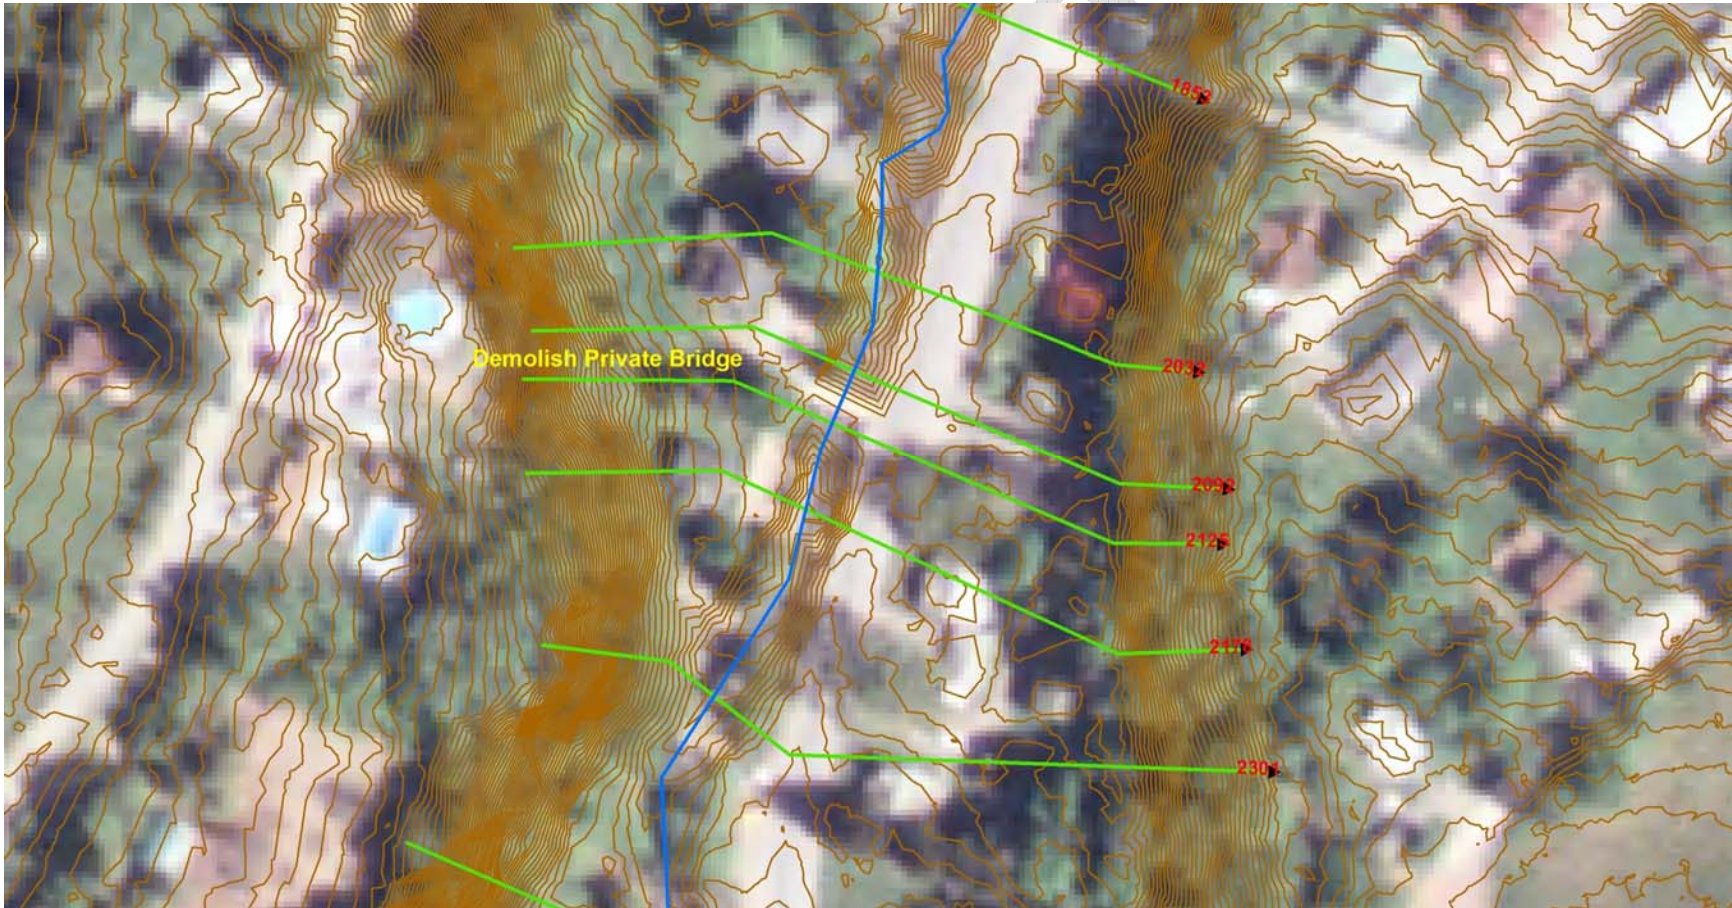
Conceptual Plan for Removing Private Road Bridge
